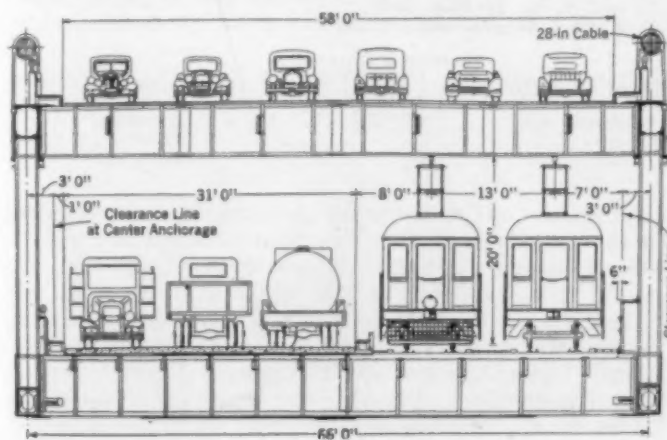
CROSS SECTION OF SAN FRANCISCO-OAKLAND BAY BRIDGE
